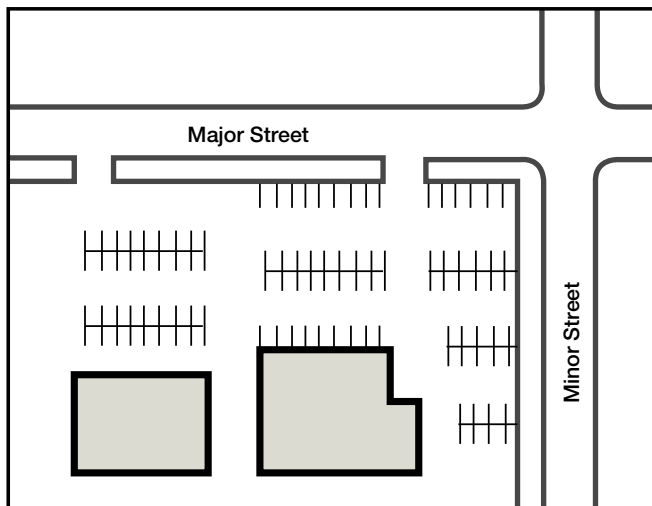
Parking Lot Layout Typical of Current Conditions on State Street
